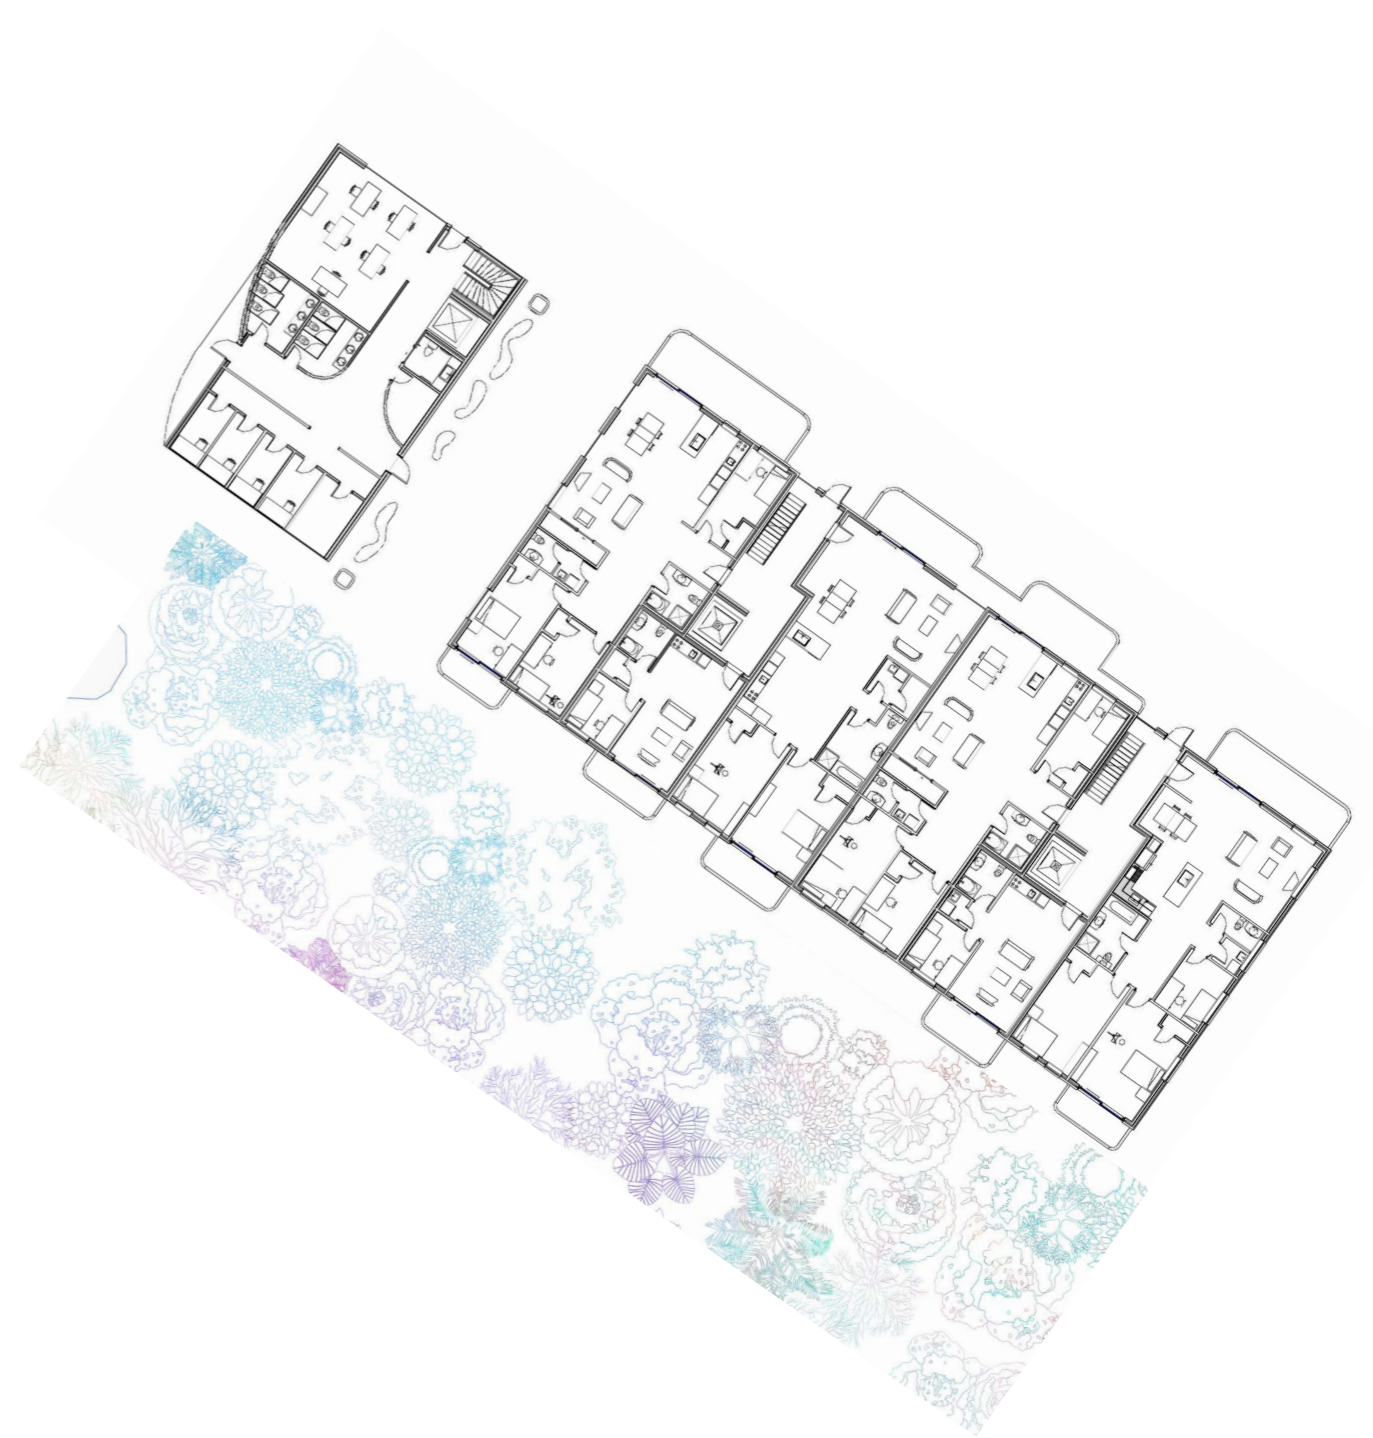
Further developed floor plan, incorporating separated apartment layout, sensory spaces towards forest, and sensory garden which separates the two building.
